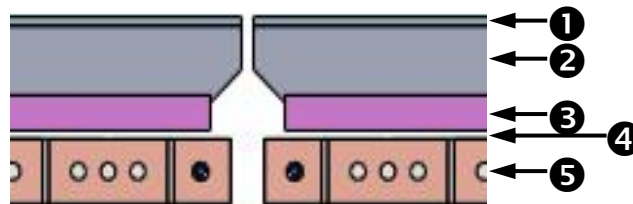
Horizontal sectional view at joint between adjacent wall panels: (1) Interior finish – 11 mm gypsum panel; (2) 100 mm reinforced concrete panel; (3) Insulation – 50 mm extruded polystyrene; (4) Air space – 12 mm; (5) Exterior cladding – 90 mm reinforced brick masonry
